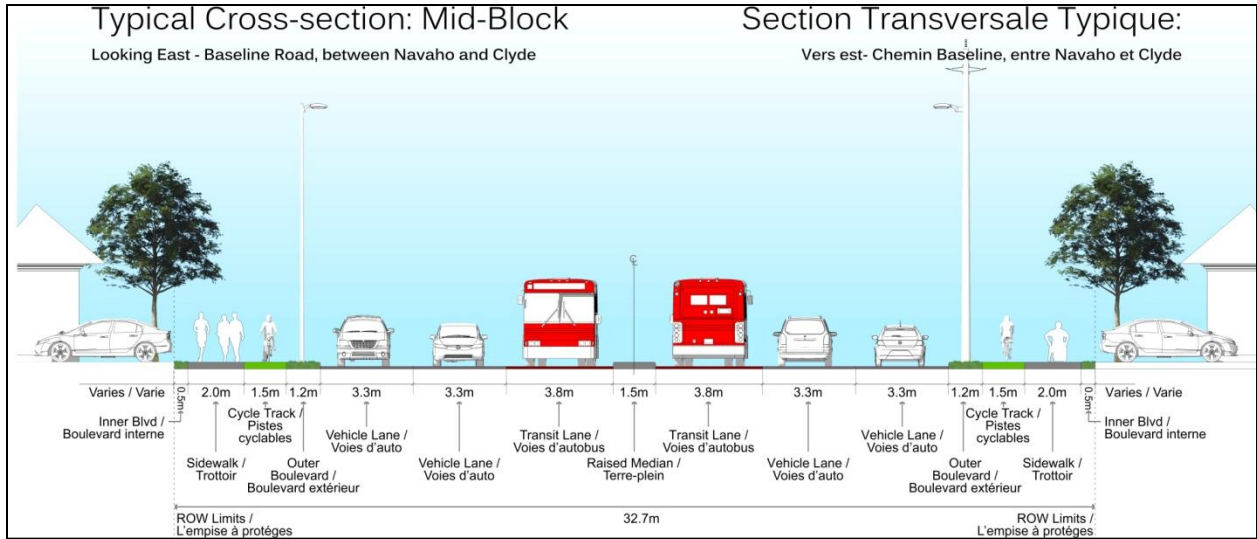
Typical cross-section - Baseline Road (Navaho to Clyde)
